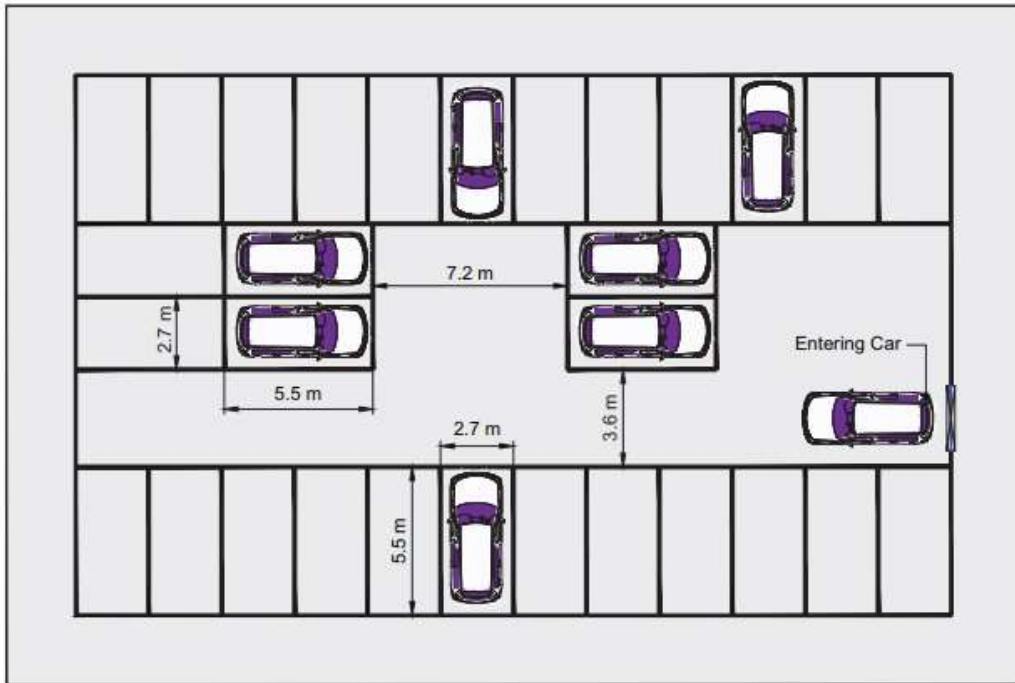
Lateral Parking System (One-Way) Dimensions
